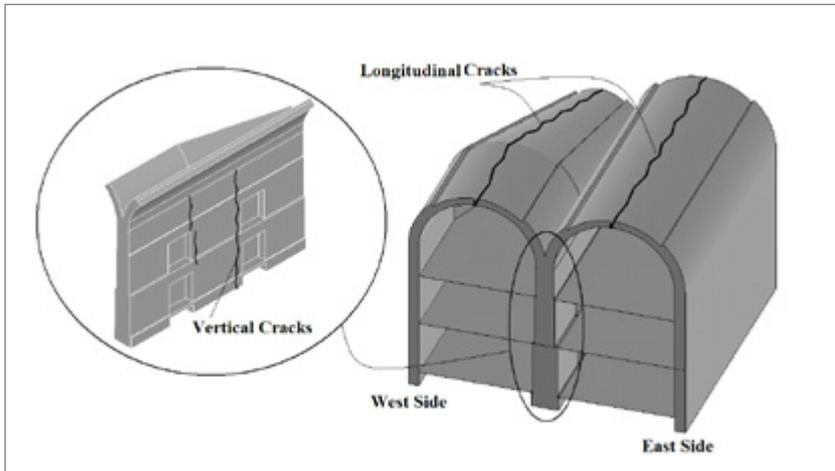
Longitudinal cracks in the vaults and the supporting wall of the Brooklyn Bridge approach structures
